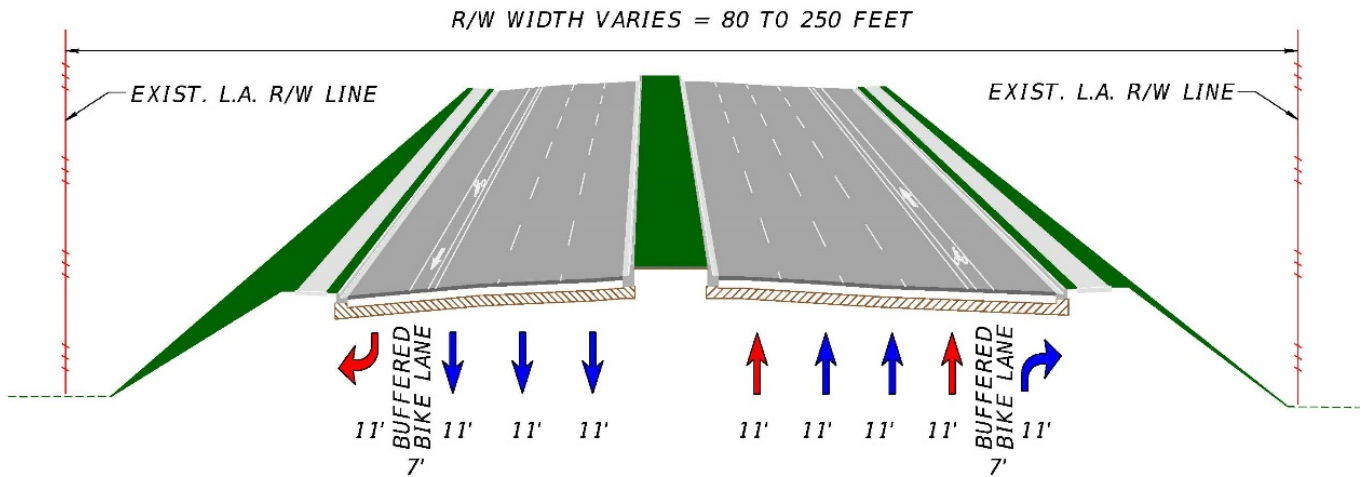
Proposed Typical Section – SR 804/Boynton Beach Boulevard
